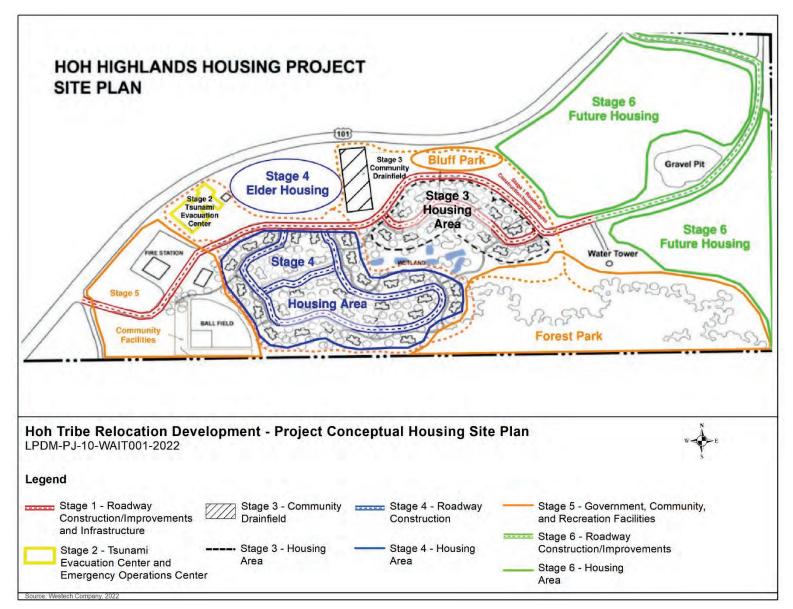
South Hoh Highlands Housing Project Proposed Site Plan
